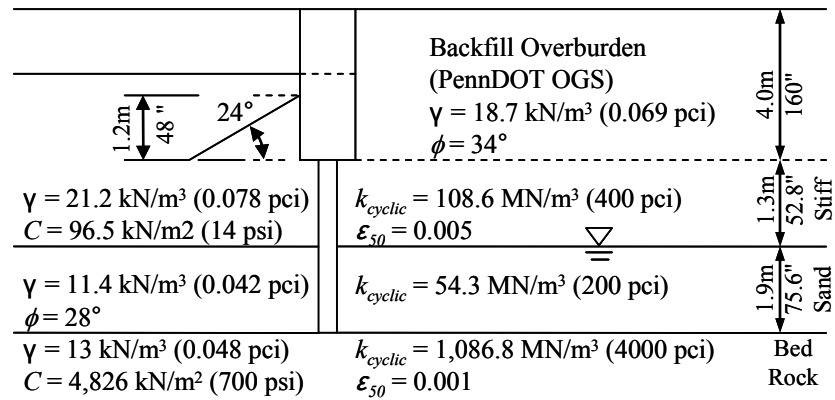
Bridge 222 Soil Properties under Abutment 2.
